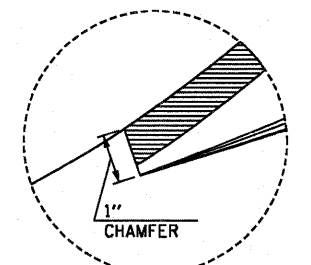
DETAIL FOR MOUNDING OF PIER FOOTINGS
